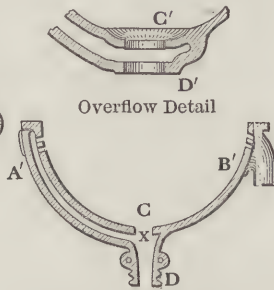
SECTION SHOWING DIFFERENT STYLES OF OVERFLOW AND OUTLETS
